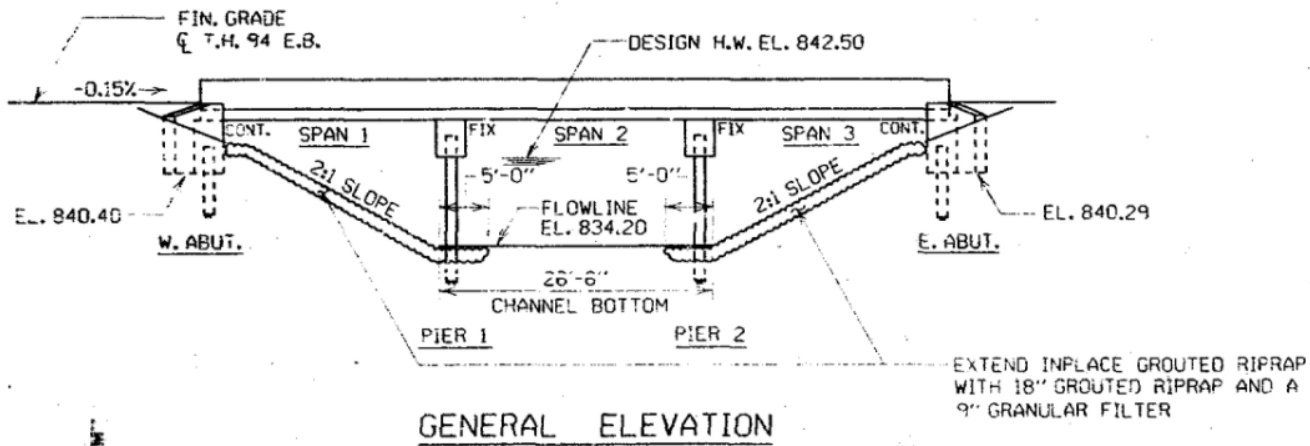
General elevation of Bridge 27909 reprinted from MnDOT (1988).
